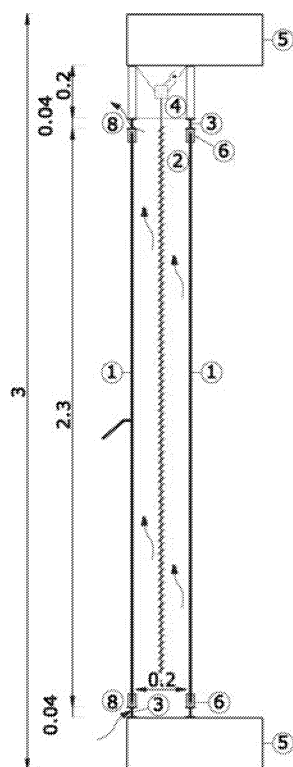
DSF section view: 1) 6 mm glass layer; 2) motorized solar protection (blade width $W=0.025$ m); 3) metallic support; 4) solar protection action box; 5) structural concrete beam; 6) aluminium frame; 7) pane opening articulation; 8) ventilation openings.
